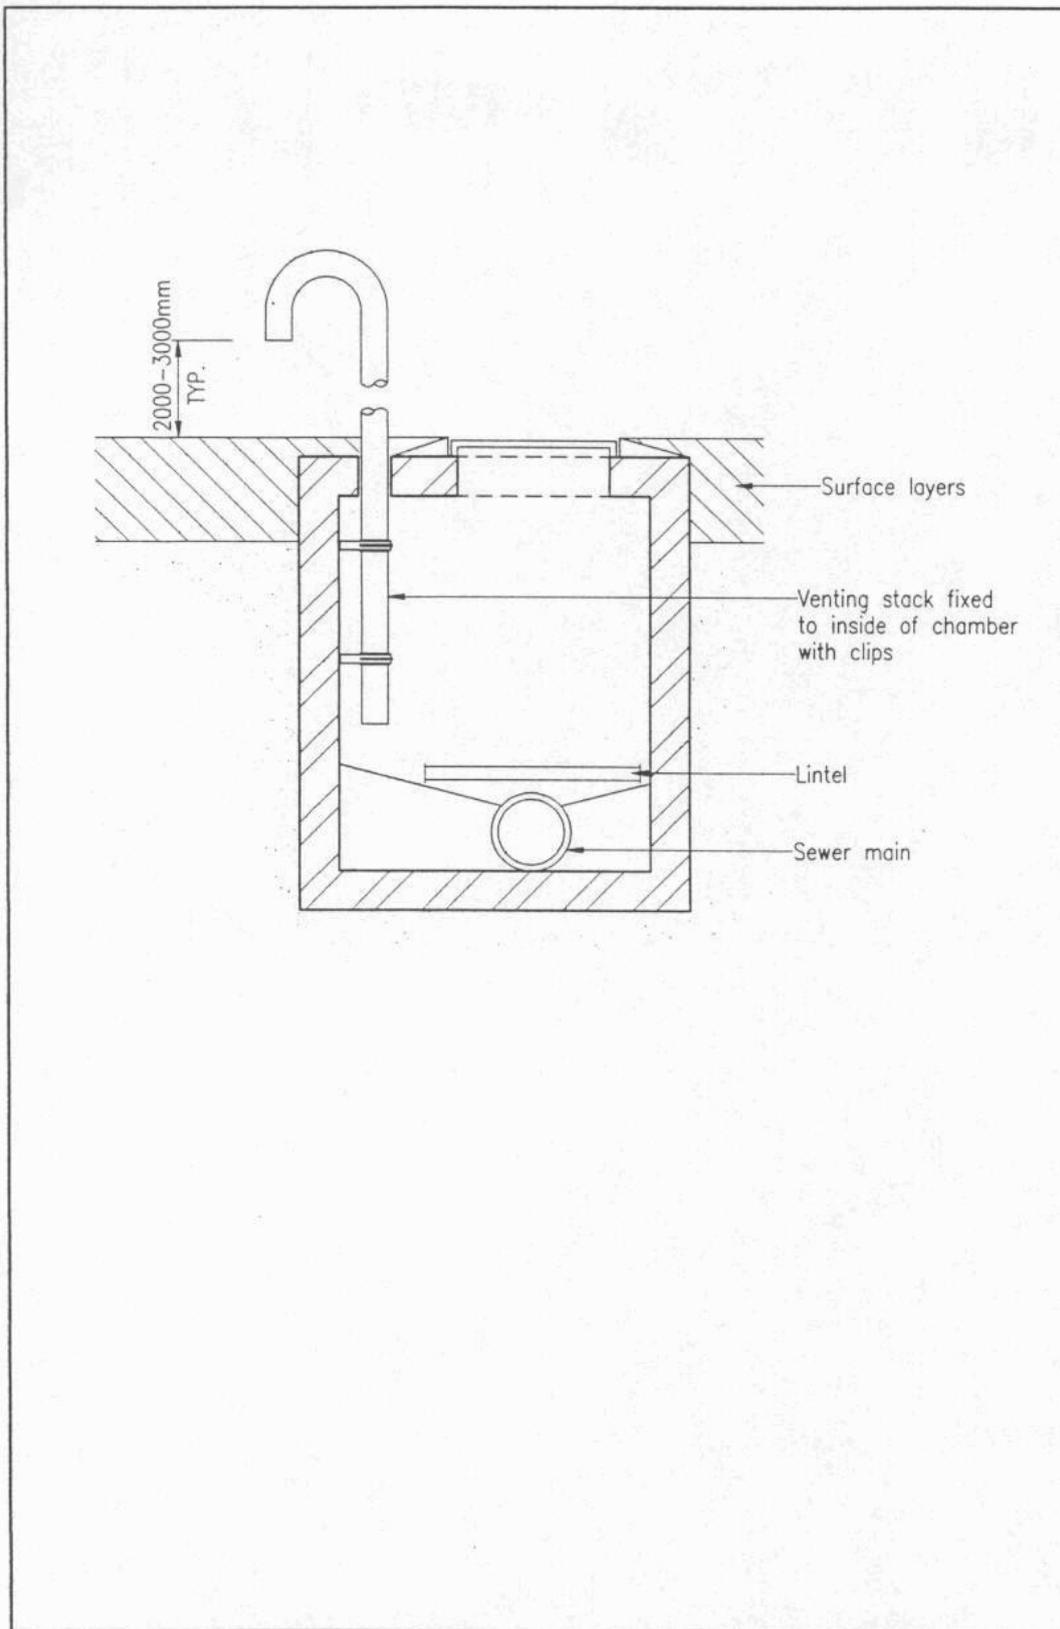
VENTED MANHOLE (CROSS-SECTION)
